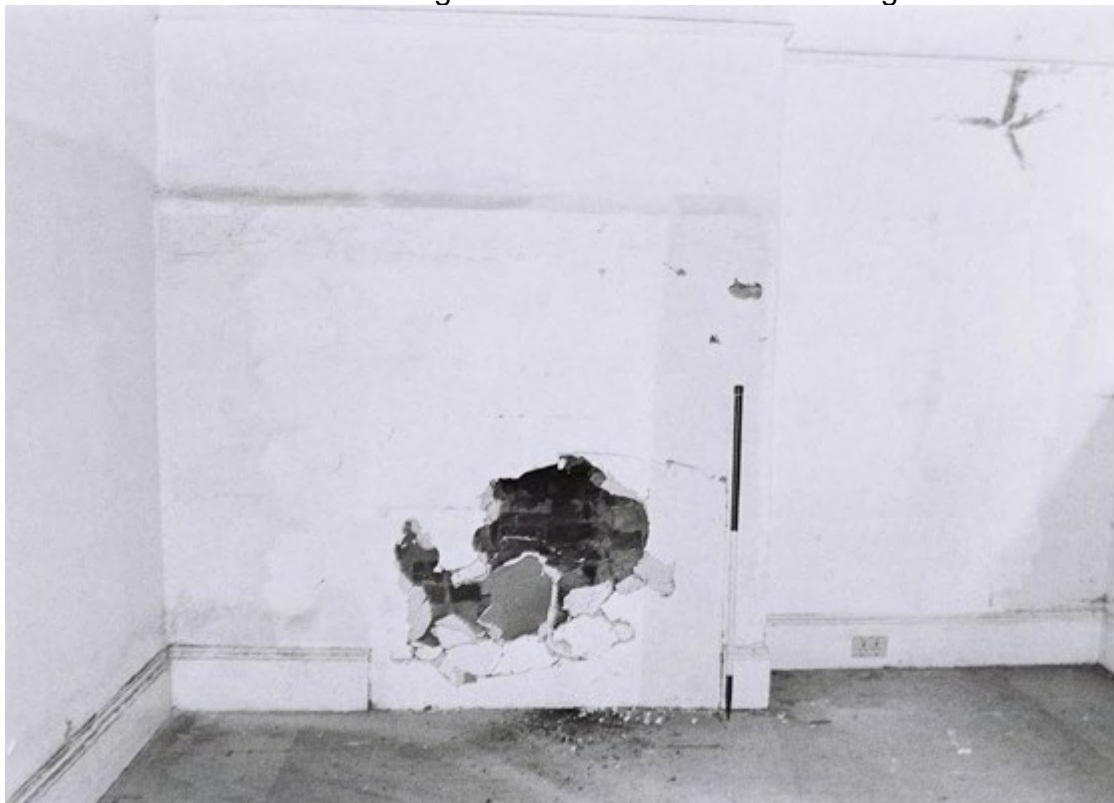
Marsden Park Cottage Interior. Ground Floor. Facing East.
